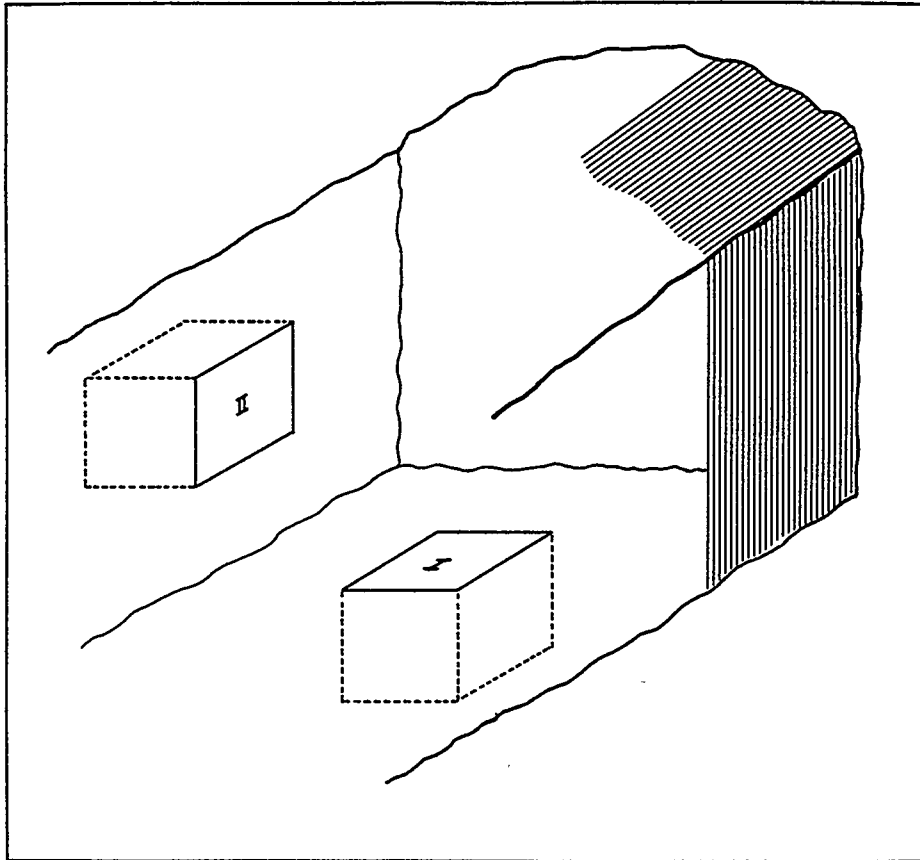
The HIM block test should be performed on a representative block of jointed rock, located in the floor or walls of a 10m span test room.
